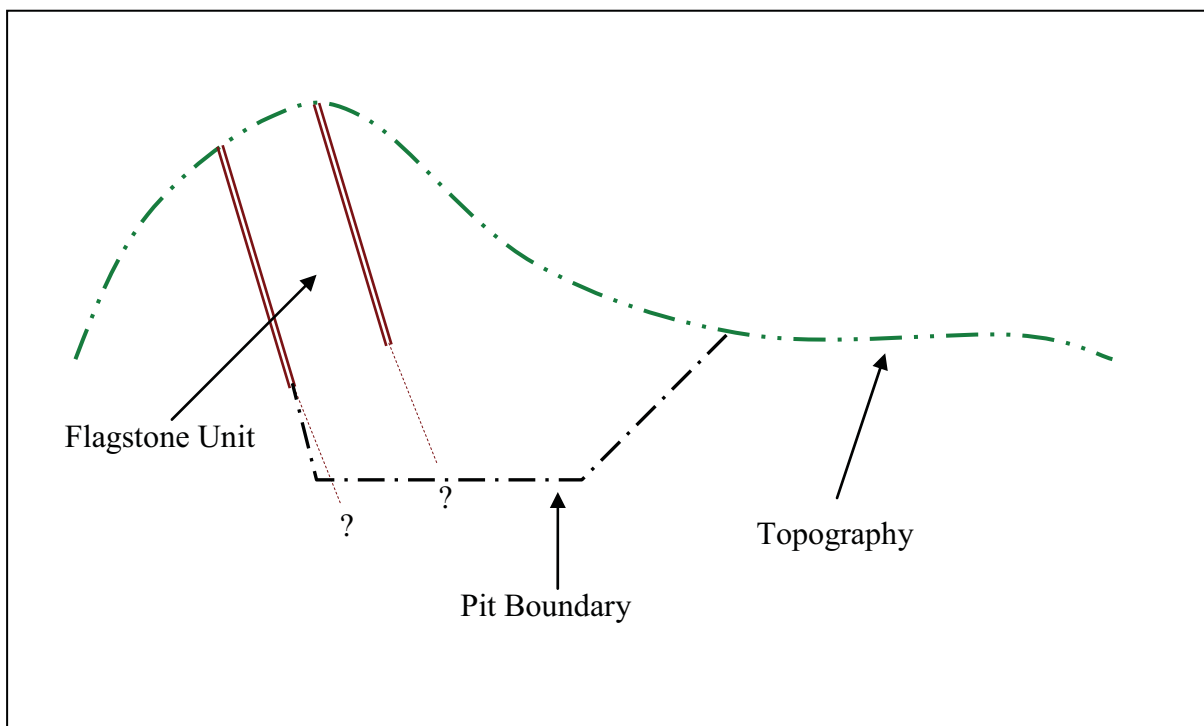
Pit 3 – Cross Section Looking North.
